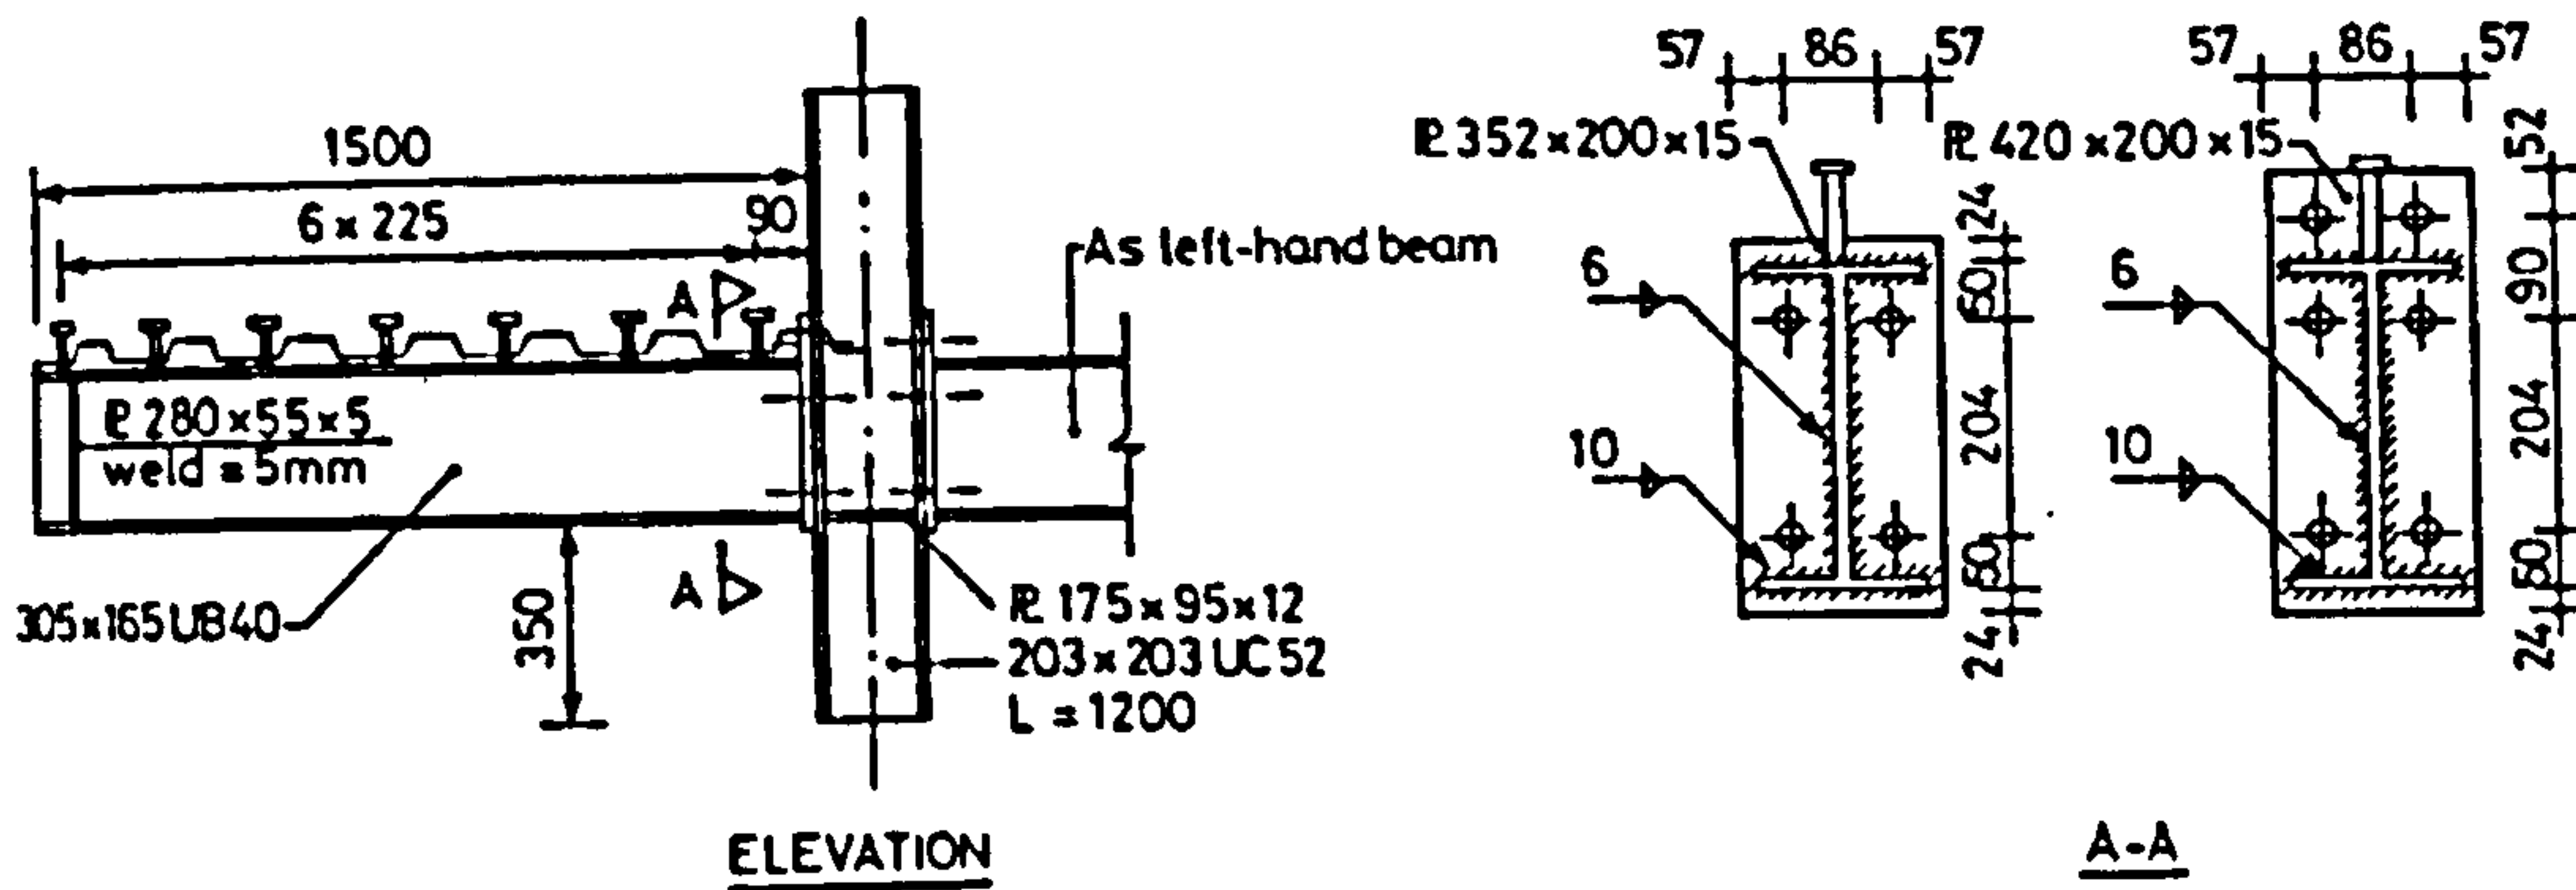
Arrangement of test specimens from Anderson & Najafi (1994)
